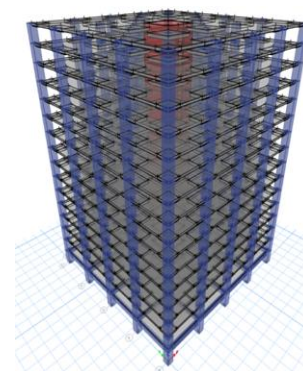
3D View and Elevation G+15[1B15FWDC]
